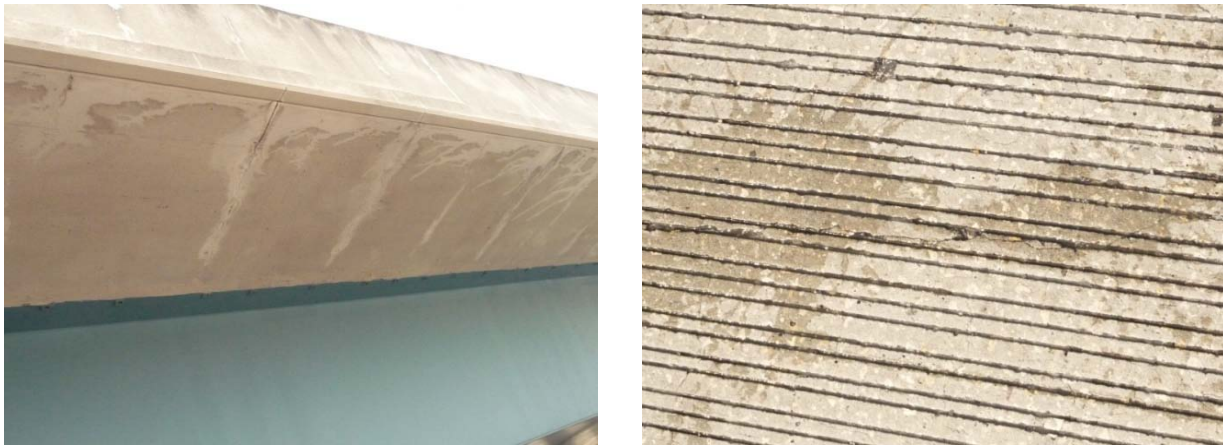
Deck cracks in Ft. Lauderdale Bridge
